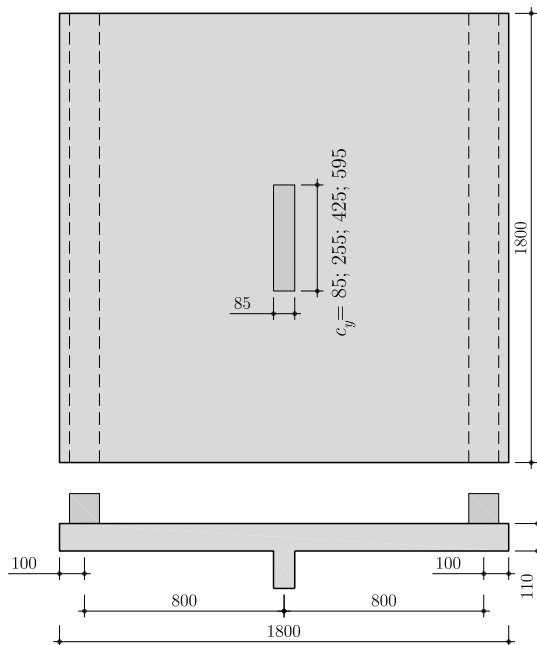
Tests on simply supported one-way slabs performed by Damasceno [Dam07] (dimensions in [mm])
